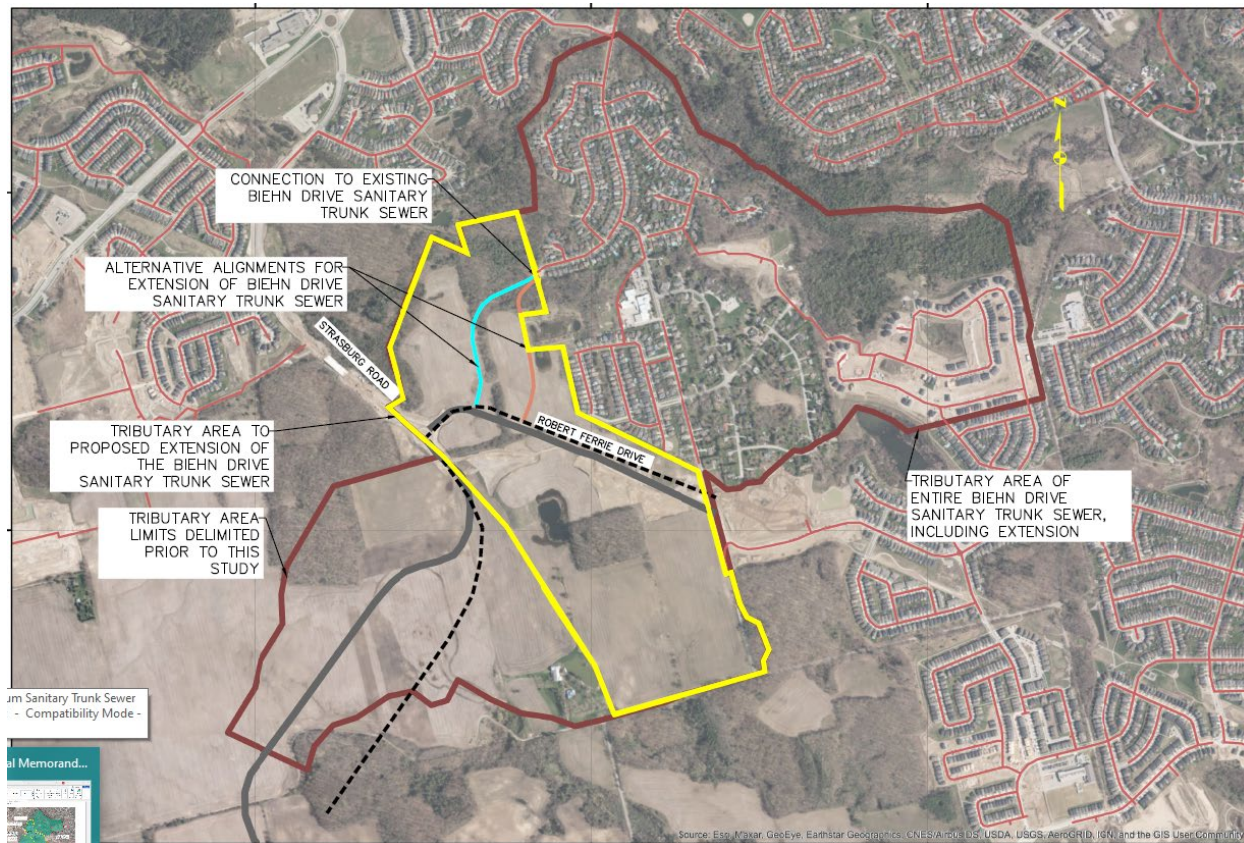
Revised Sanitary Trunk Sewer Drainage Area
